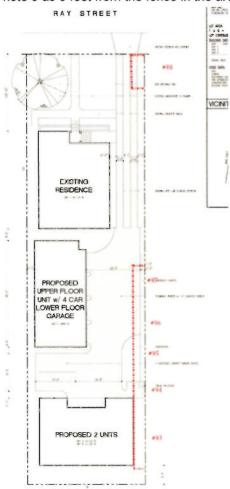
Tree Protection Zones (TPZ) shall be established to protect off-site trees. The TPZ will be an area 5 feet from the fence in the areas with trees.
